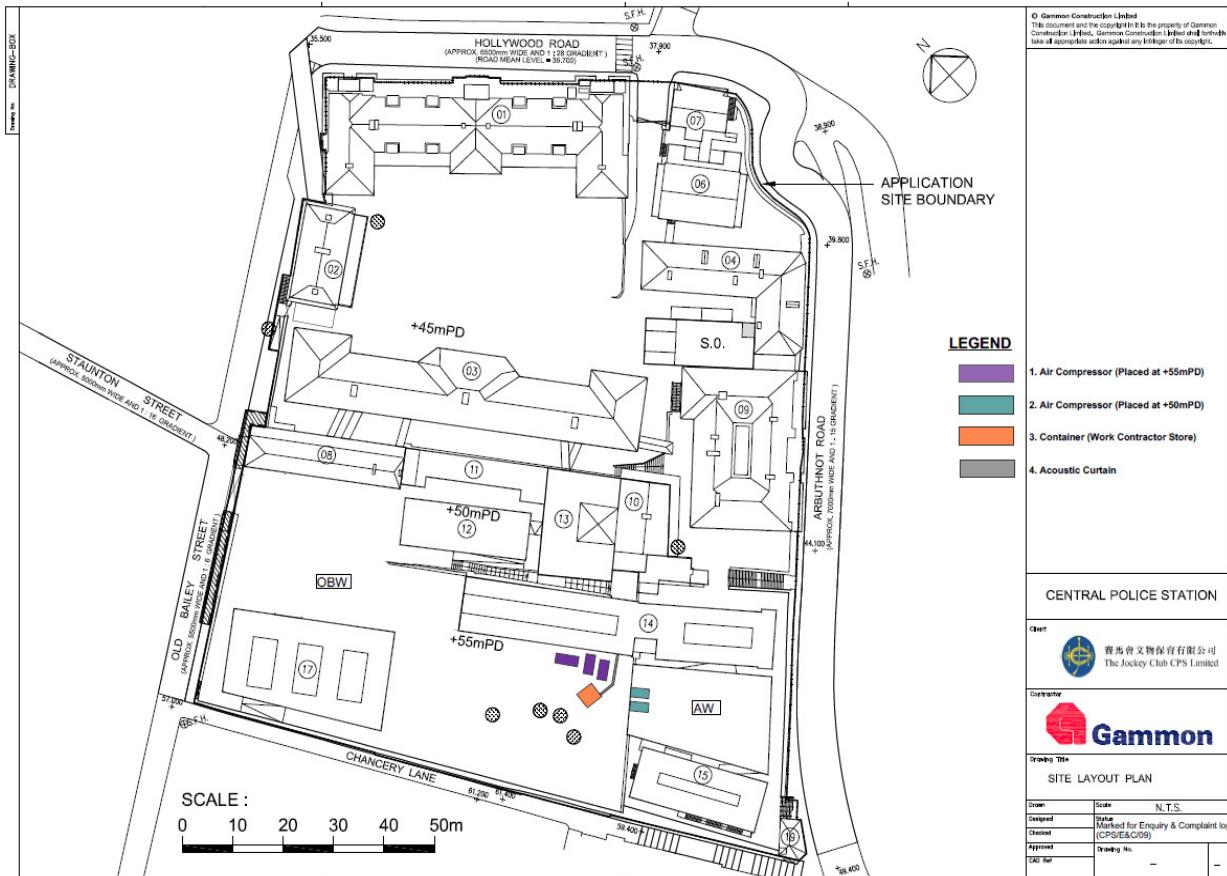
Site layout plan showing locations of air compressors and noise barrier
